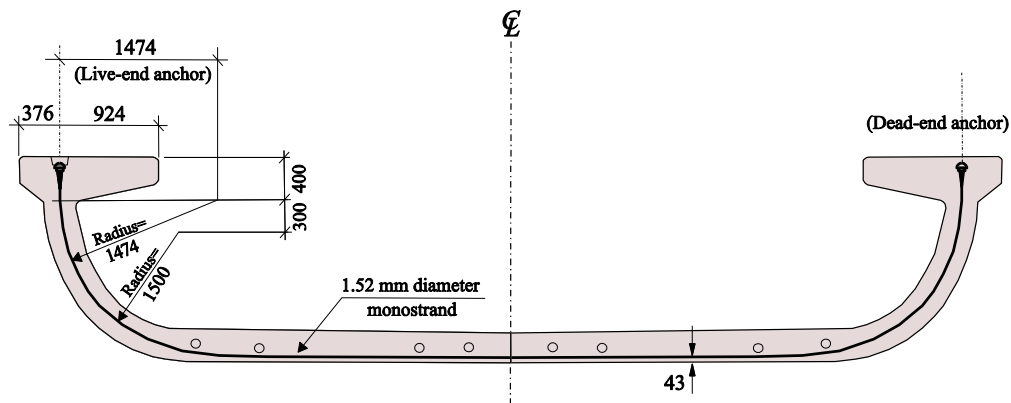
The second line of the metro of Monterrey: transverse tendon layout and cross-section [Baamonde 2009]
